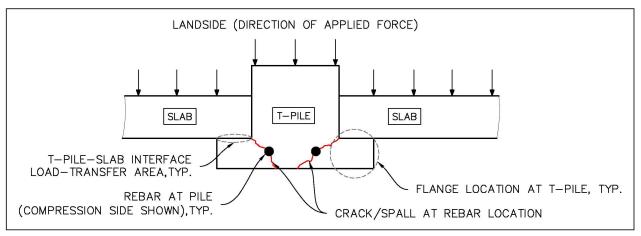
T-Pile and Slab Structural Connection Plan View. Failure at Compression Flanges.
